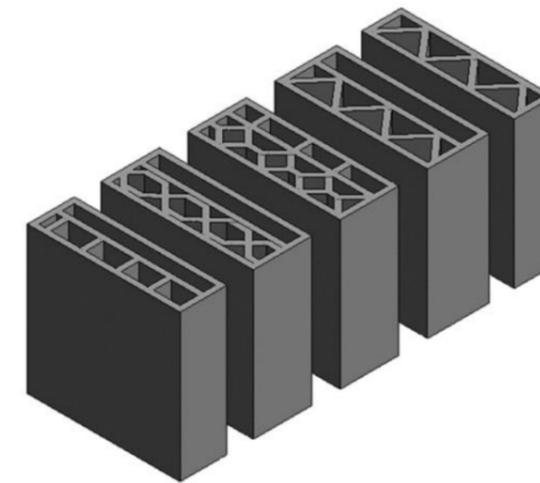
| A 3D printed curtain wall with cavities to enhance thermal properties of the wall.
